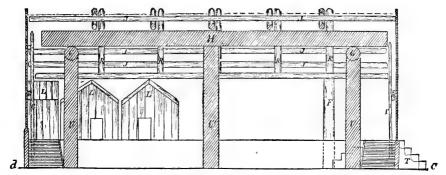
Construction of Kwakiutl house. Longitudinal section, from c to d.
